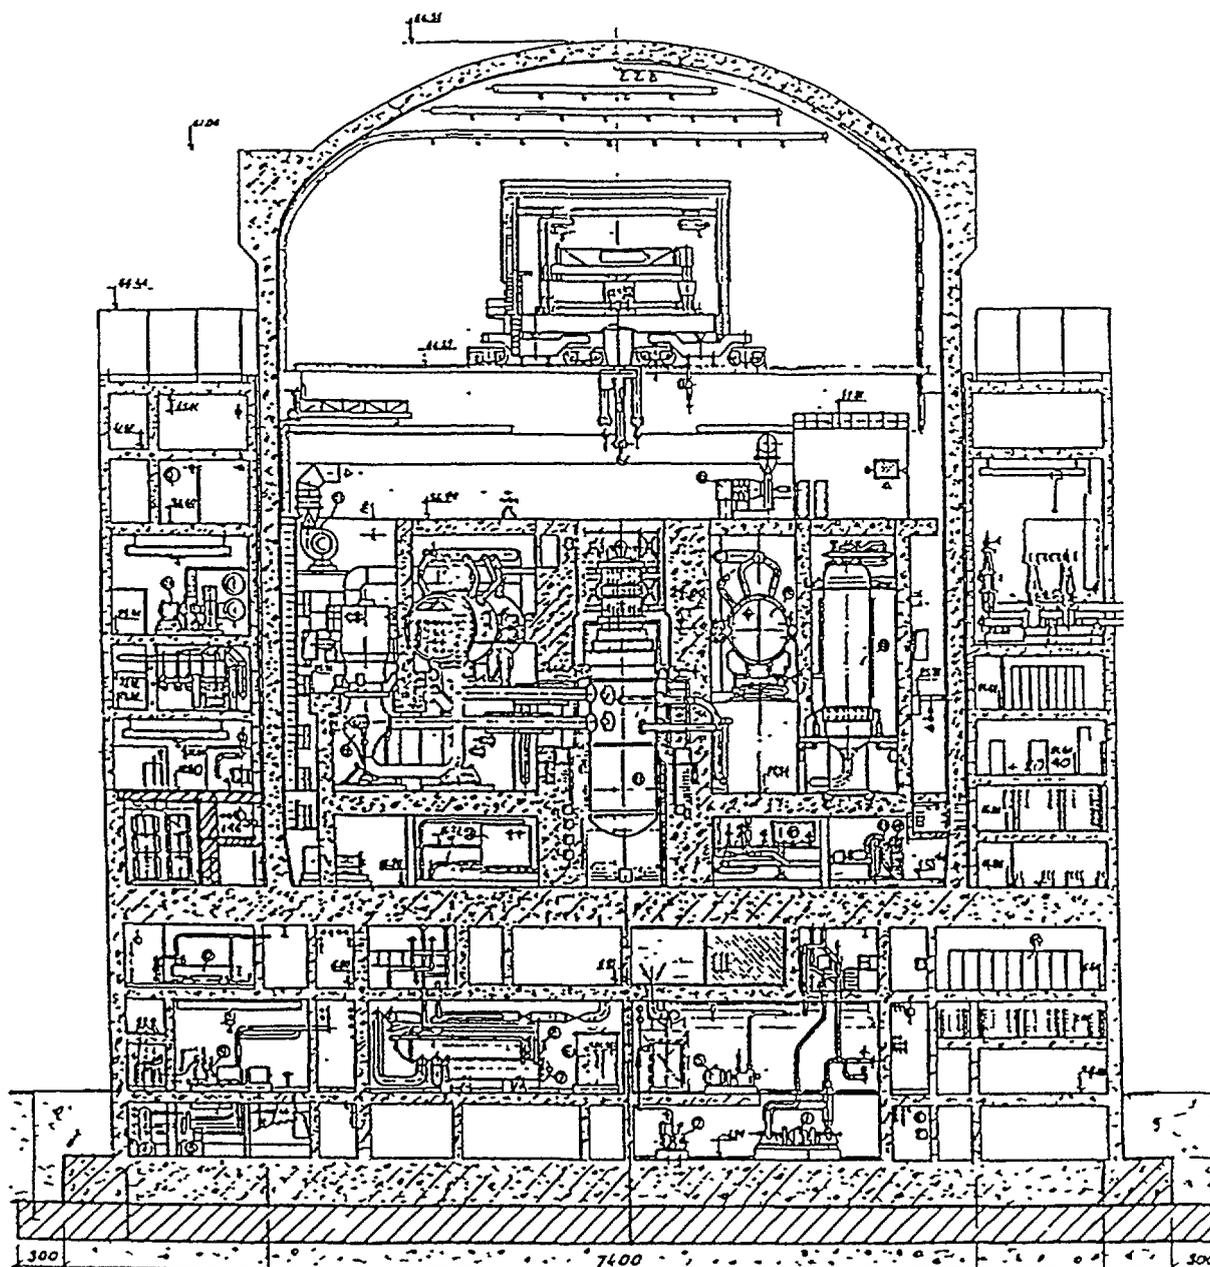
1 WWER-1000 MW Reactor Building Cross Section
